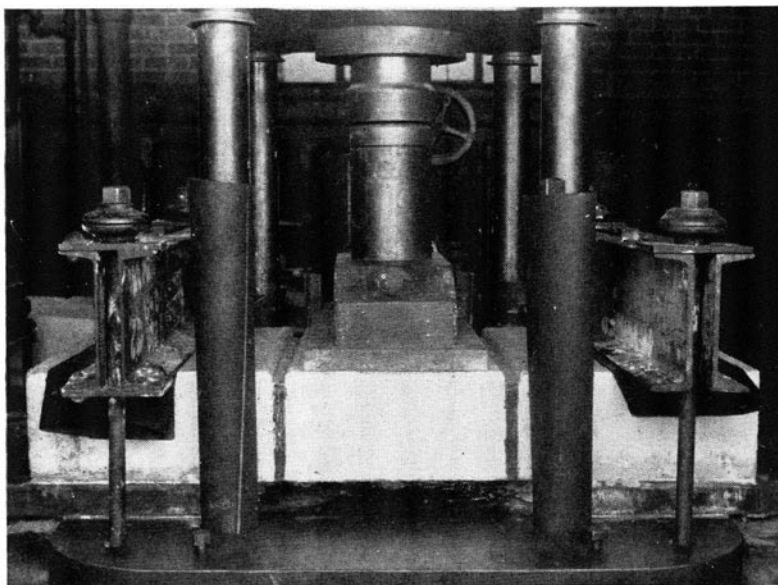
SLAB AND TESTING APPARATUS, LOAD TRANSFER TESTS.
